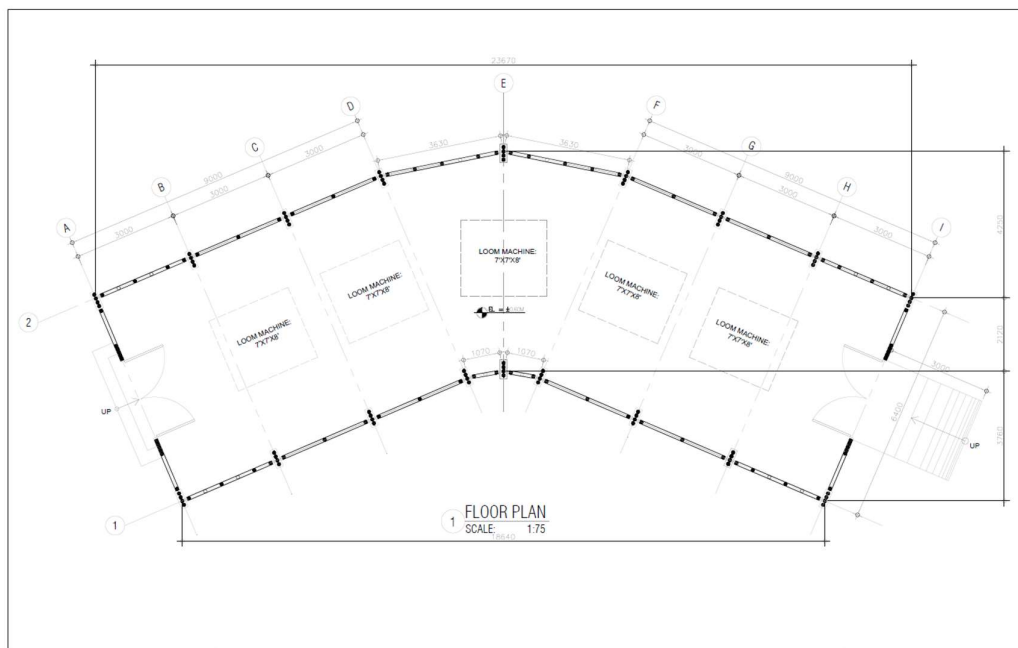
Floor Plan of the case-study building: Kanya Kawayan weaving centre. Northern direction upwards in the plan. Drawing not to scale. Drawings provided by Base-Bahay Foundation.
